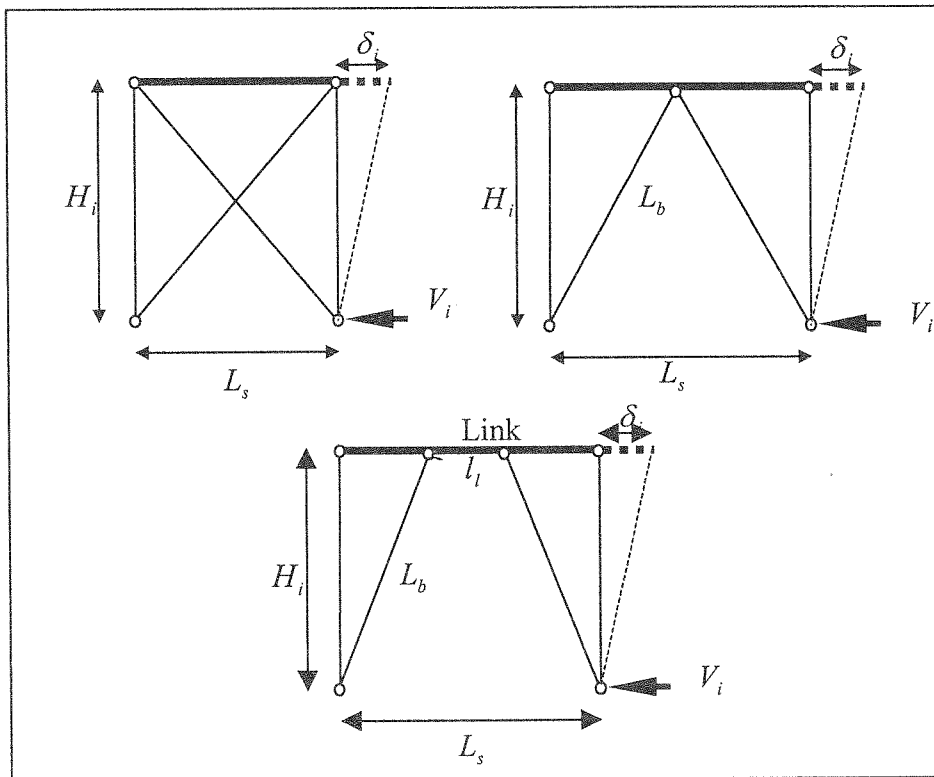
Structural models for X bracing, chevron bracing and eccentric bracing systems.
